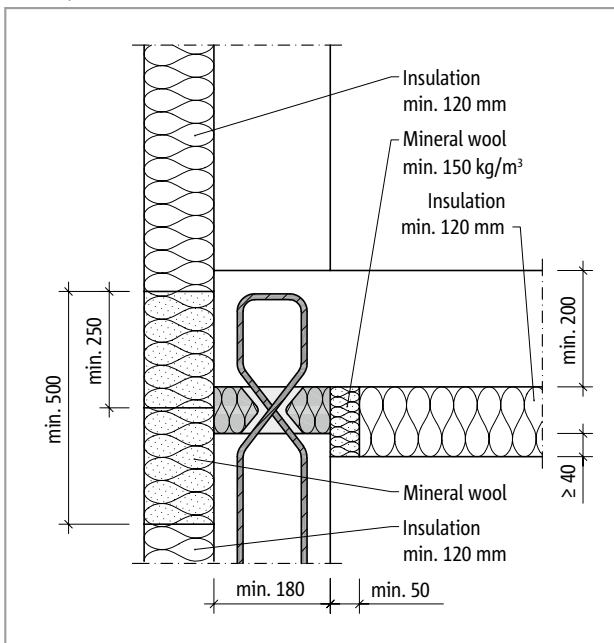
Schöck Sconnex® type W: R 120 / EI 120 with external wall and under-slab insulation
